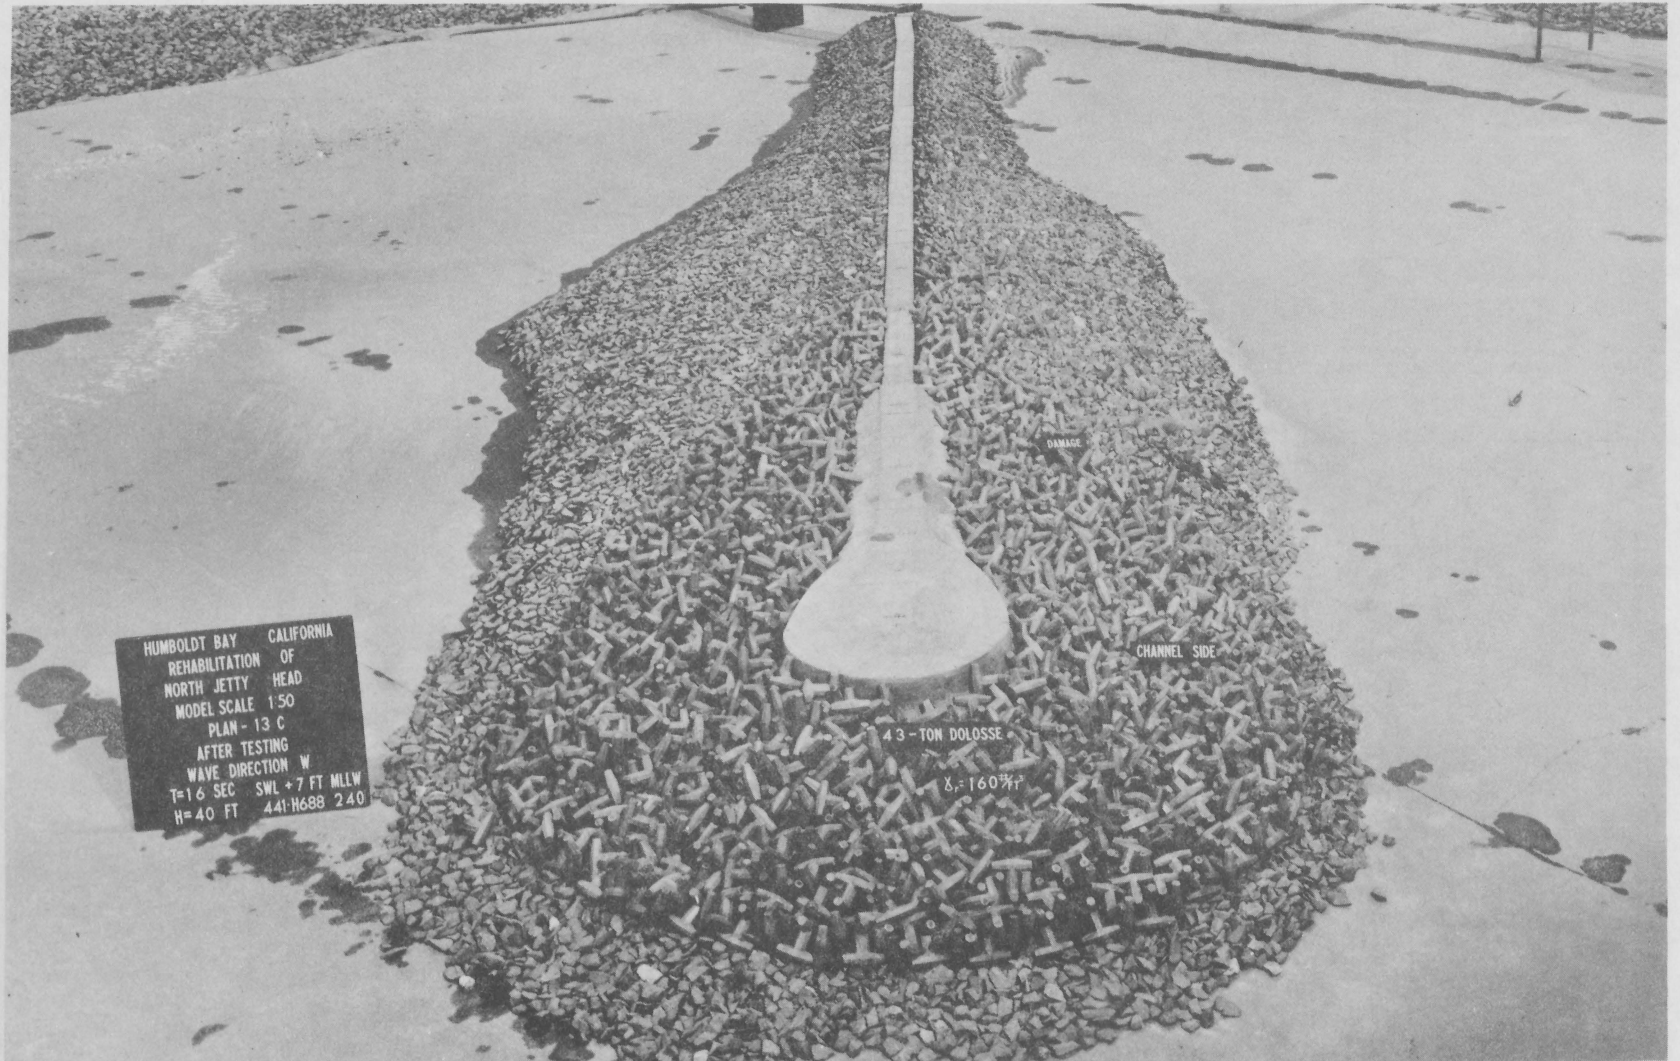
Jetty plan after attack of 16-second, 40-foot waves with stillwater level of +7 feet (unlinked 43-ton dolosse), Humboldt Bay Jetty model (Davidson, 1971b).
